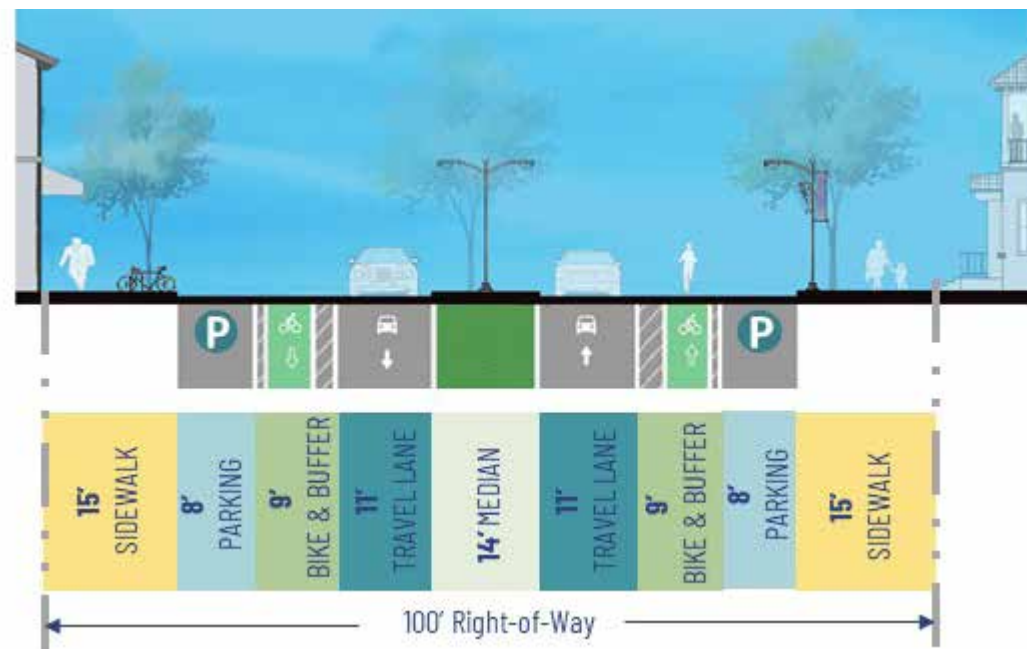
Grand Avenue Class II Alternative Road Section
